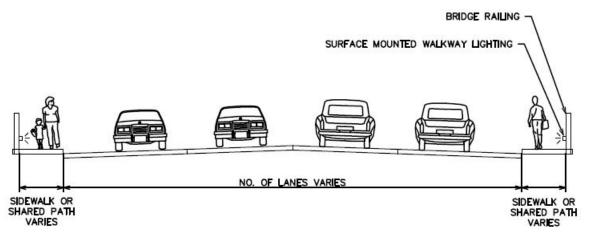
Typical Section of Walkway Lighting Added to Existing Crossing
